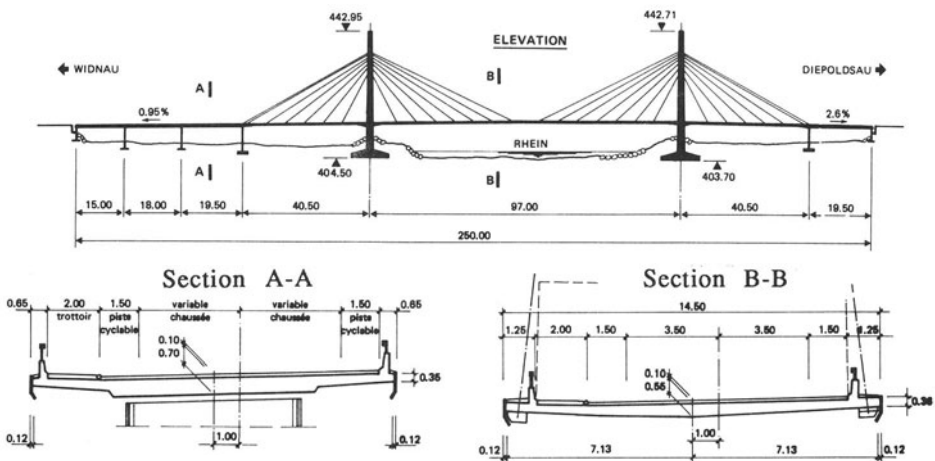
Elevation and cross-sections of the Diepoldsau Bridge.
